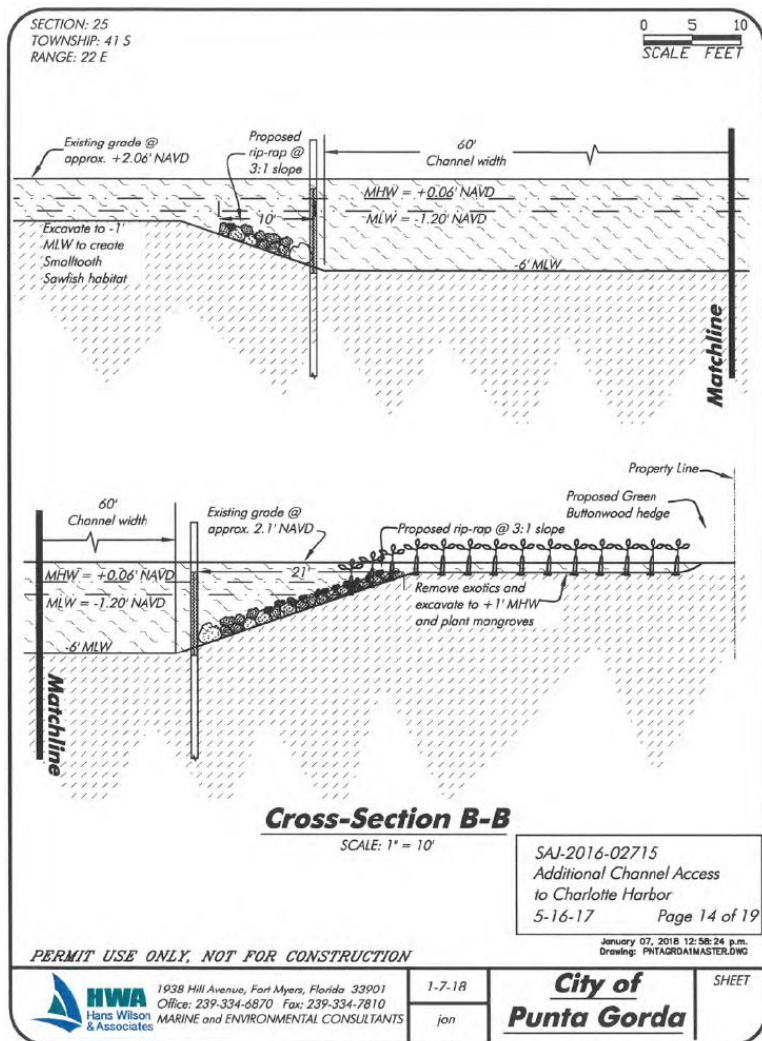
Cross section of B-B in Figure 2 above, showing the proposed riprap revetment and aquatic enhancement in the proposed channel cut. The west-side revetment at the entrance to the shallow water area to the west is shown at the top and the east-side revetment is shown on the bottom (Image supplied by USACE).
